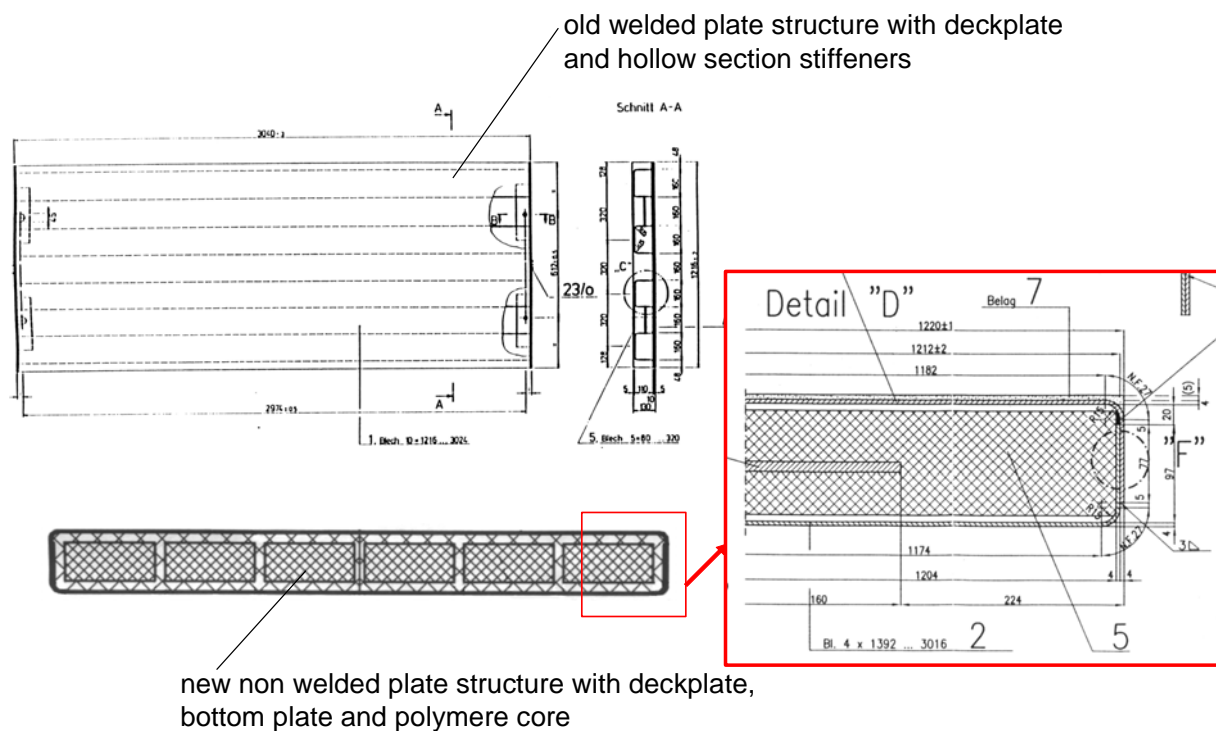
New plate structure using SPS for temporary bridges [Krupp]
